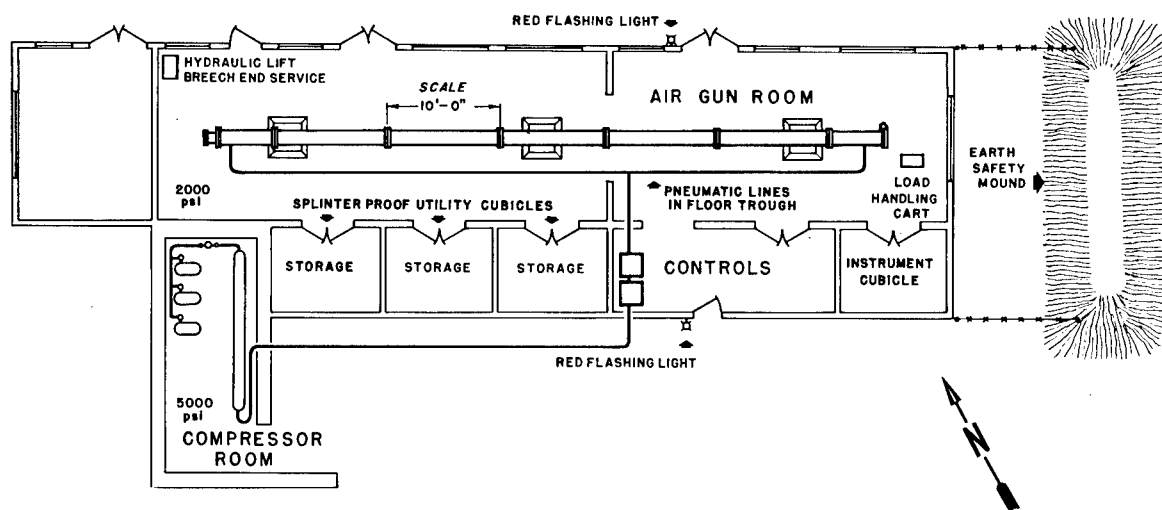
Seal Beach 13-1/2-in. air gun facility arrangement
